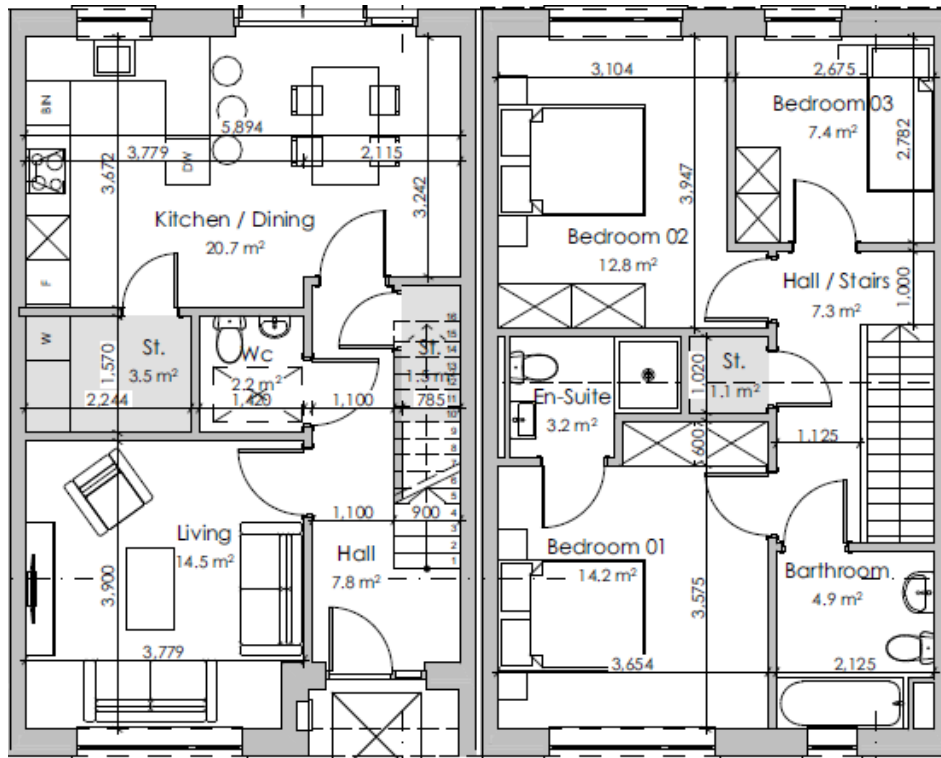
Ground (l) and first (r) floor plans of House Type 3.4.
